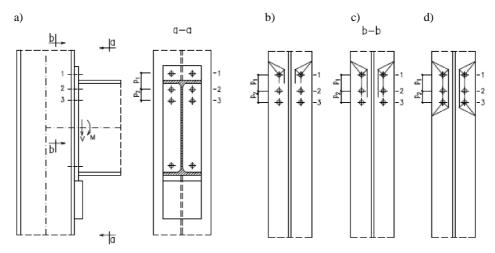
Joint of a beam with an unstiffened column; a) side view and section a-a, b), c) and d) yield lines of a column flange
